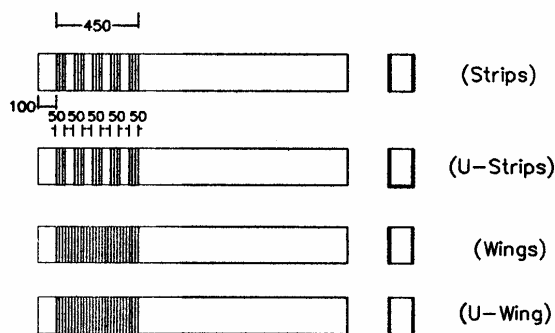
CFRP schemes used for retrofitting and strengthening.
